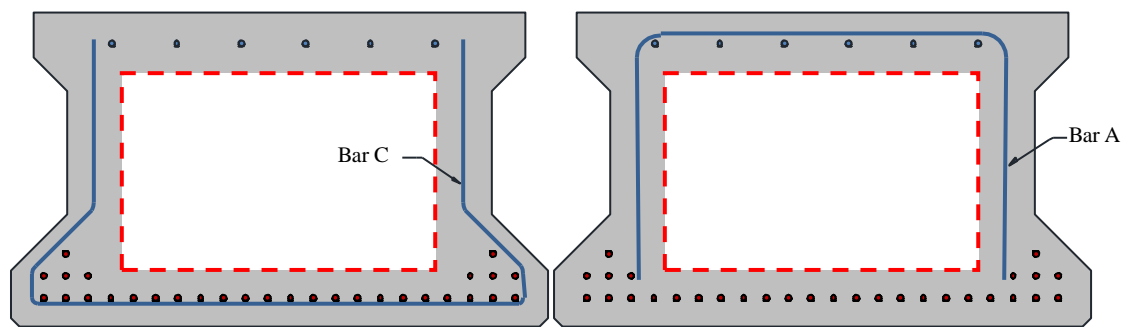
Shear reinforcement bars in 4B28 box beams.
